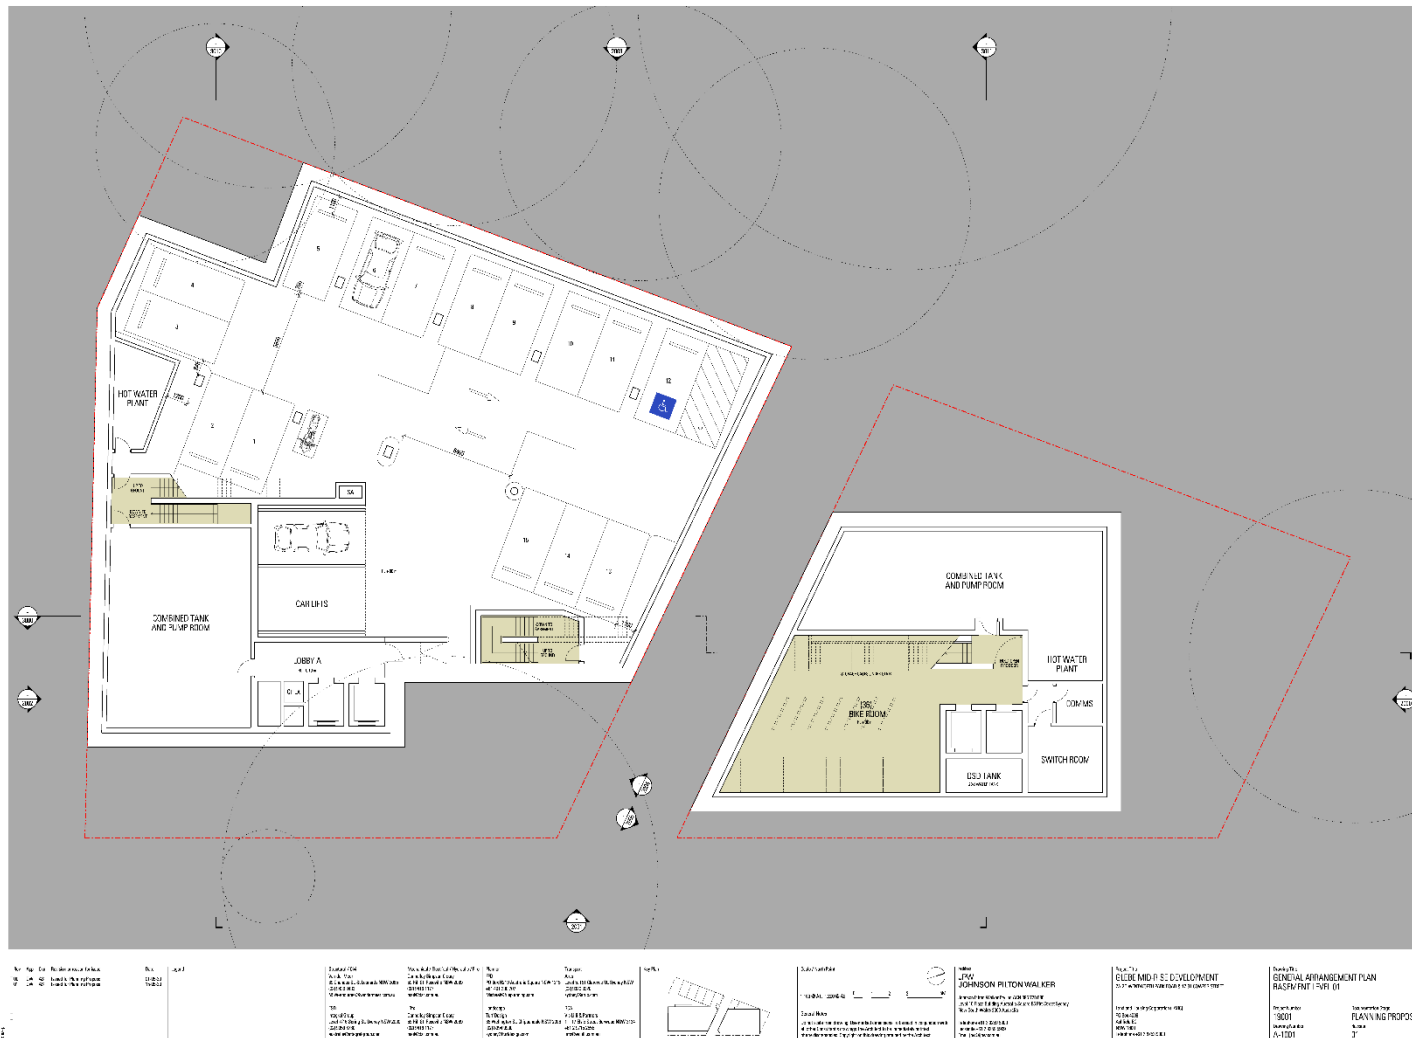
Finalised concept plan of the proposed development, Revision 1 05-15-20. Basement level 1, comprising a carpark at 17-31 Cowper Street and bike storage at 2A-2D Wentworth Park Road, is shown in this plan (Source: Johnson Pilton Walker 2019).
